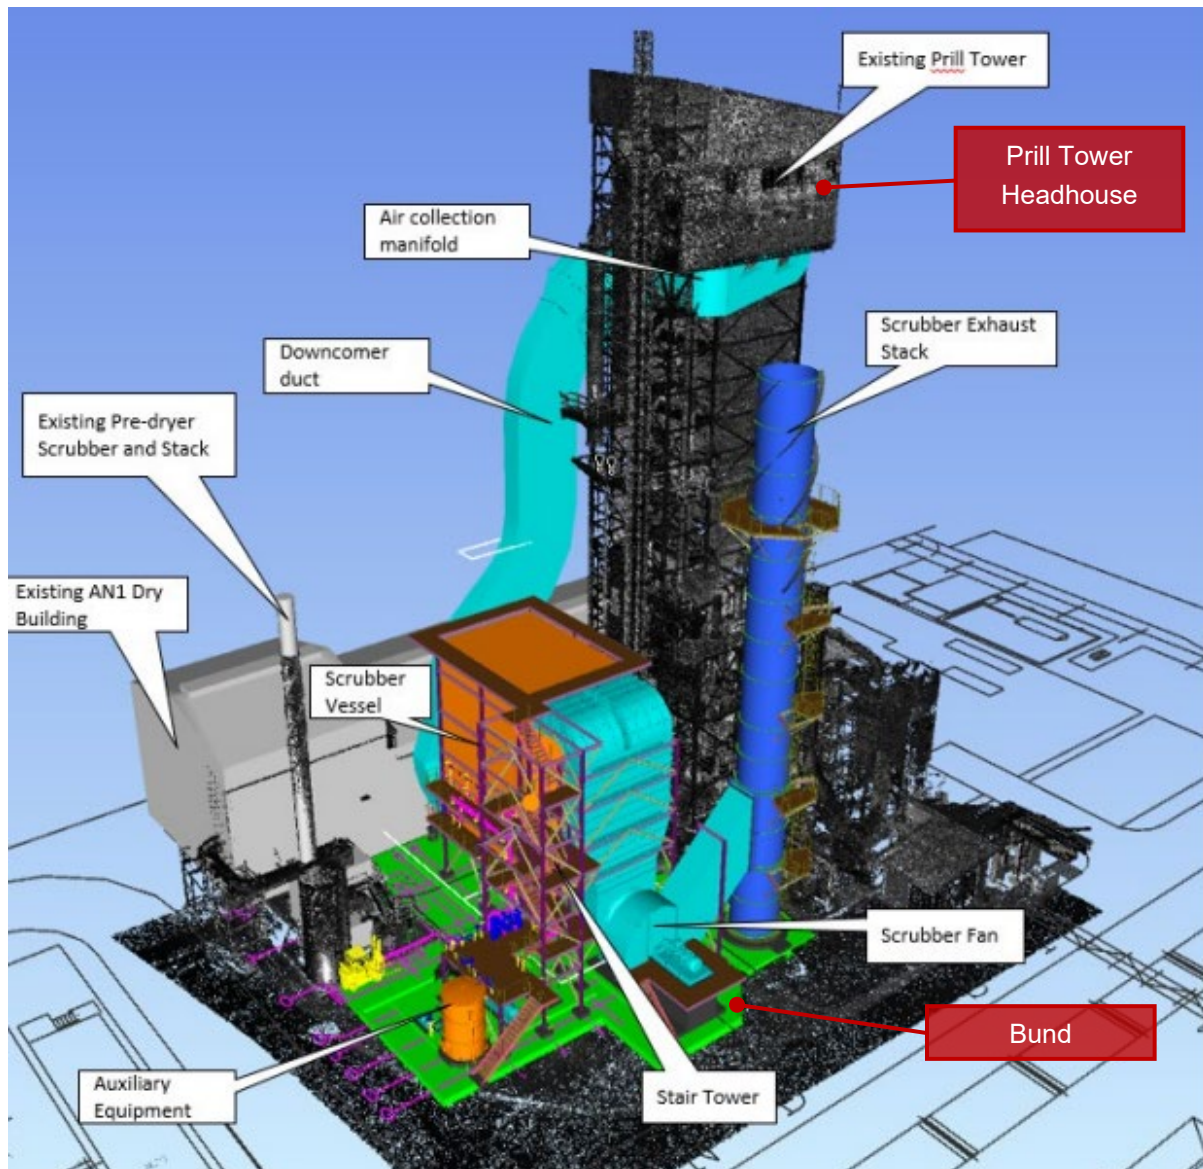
| Layout of proposed scrubber (existing prill tower in grey)
